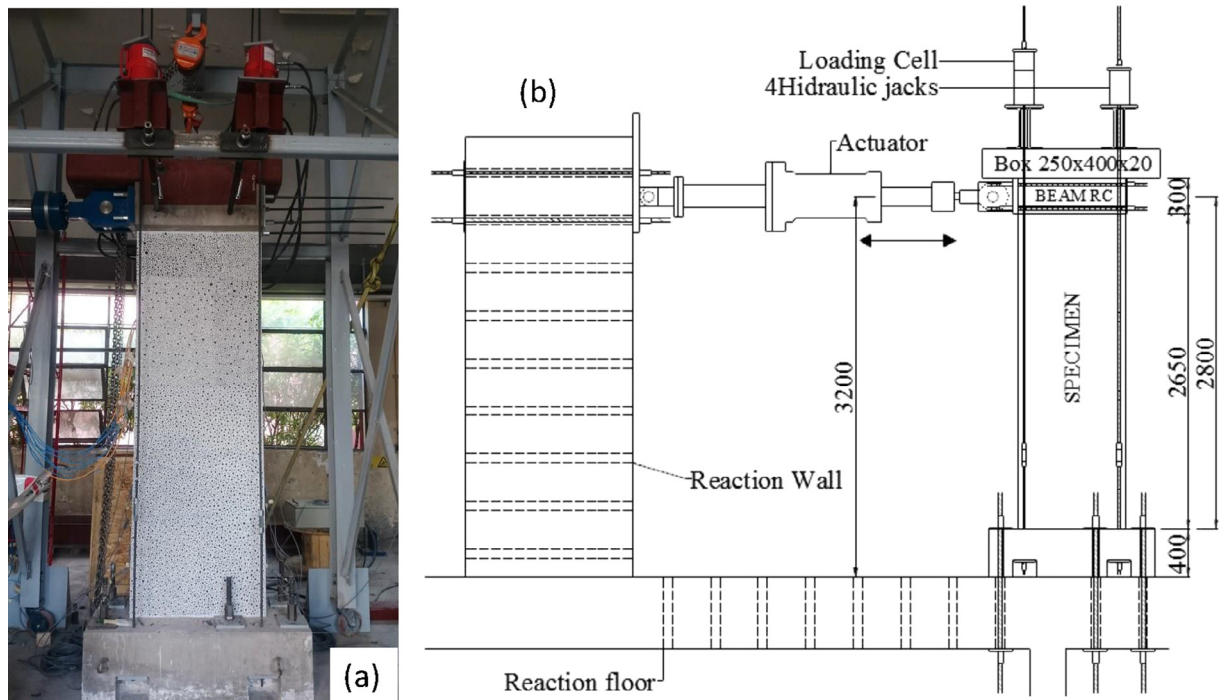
Test assembly and scheme – (a) actual setup, and (b) global scheme.
